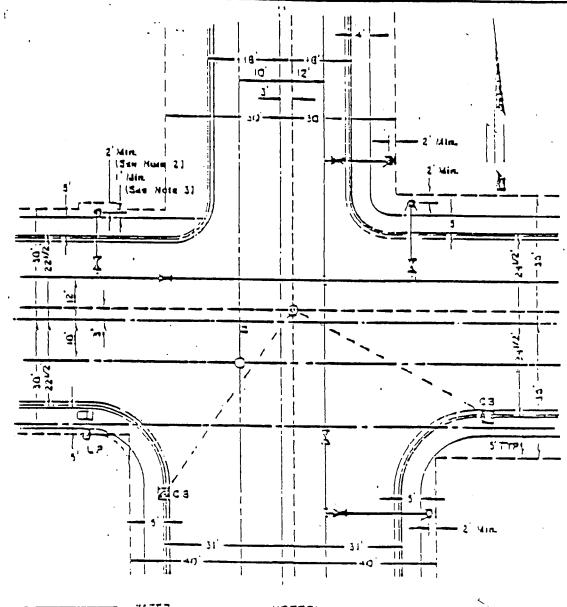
STREET SECTION "URBAN" DESIGN
